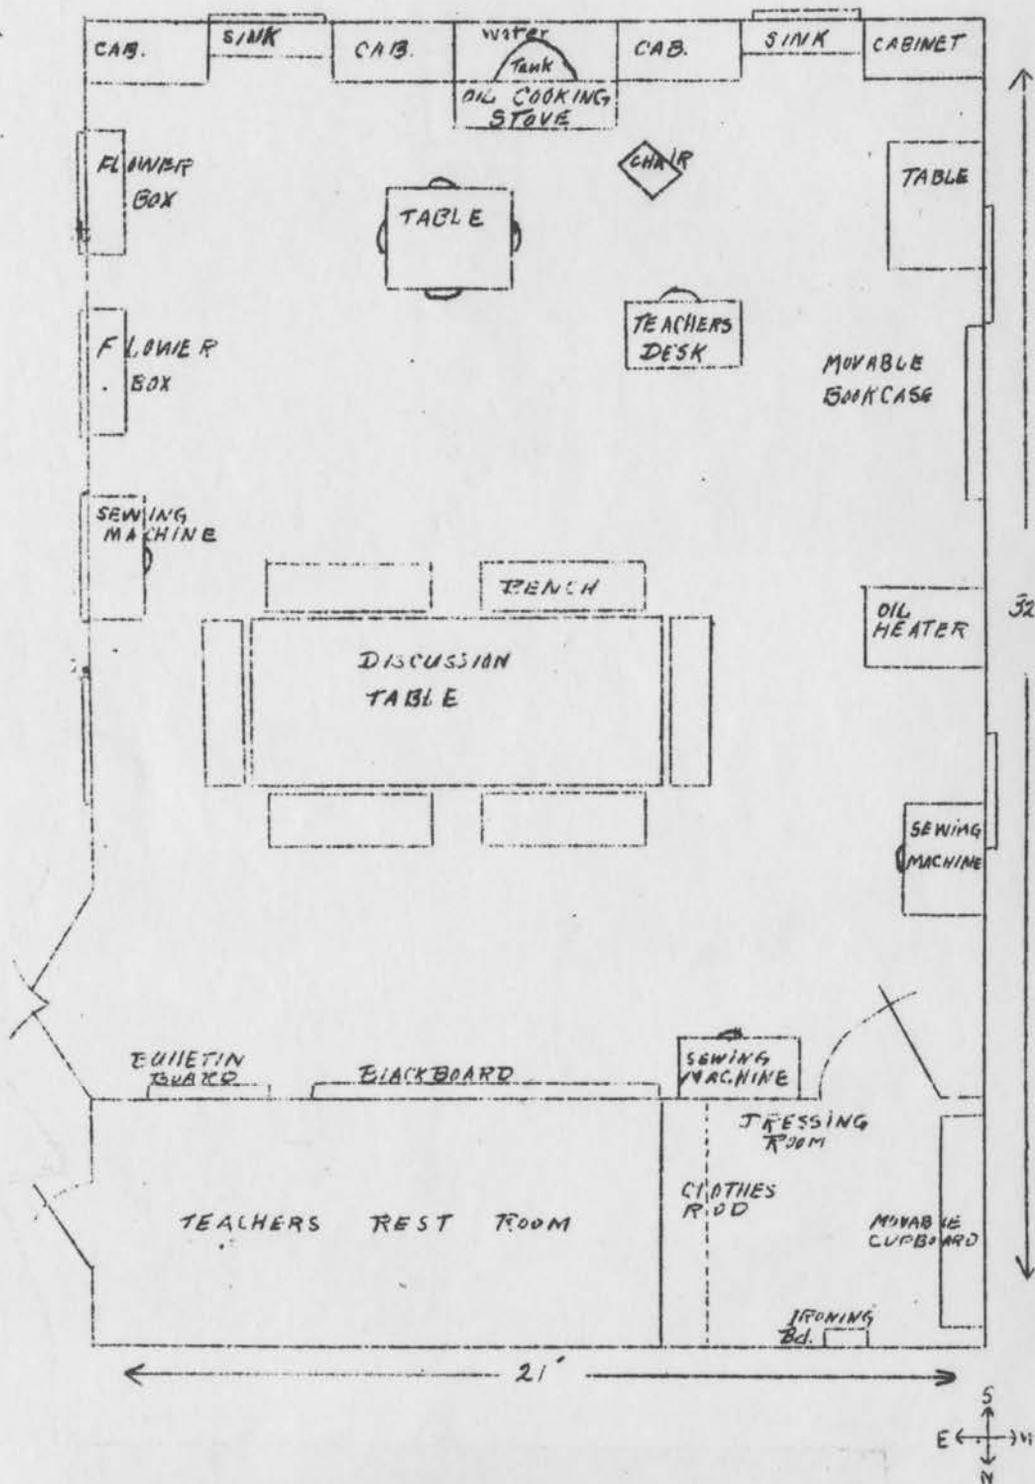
FLOOR PLAN FOR MAMMOTH HIGH SCHOOL, MAMMOTH, ARIZONA, 1940.
